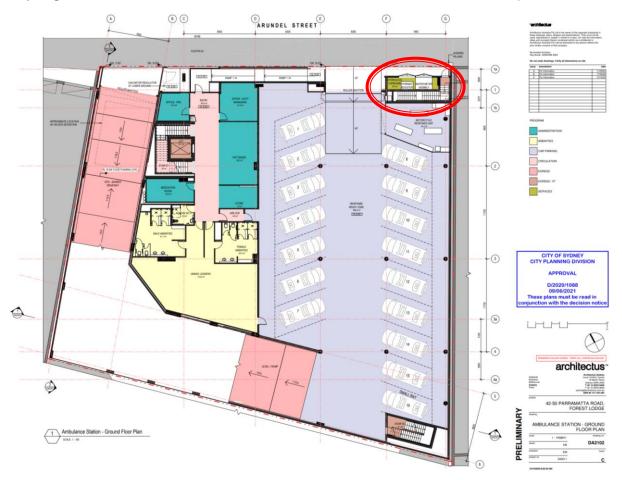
Approved Ground Floor Plan with location of proposed substation circled (Architectus)
